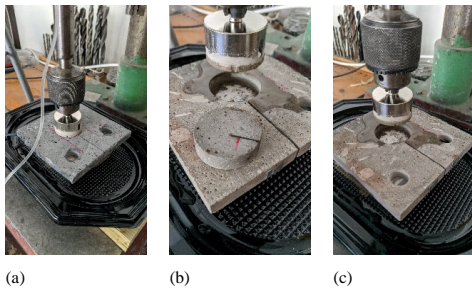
CT specimen notch base sample drilling process, RTU lab
